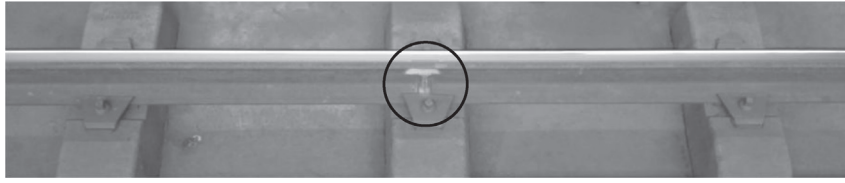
Aluminothermic weld over the sleeper.
